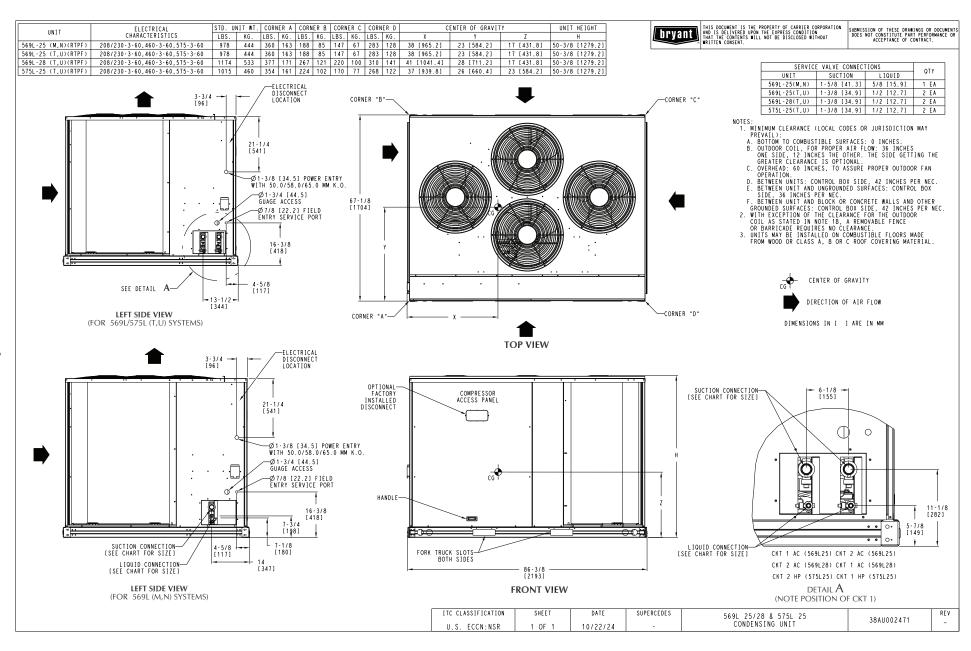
569L*25(M,N) / 569L*25-28(T,U) Base Unit Dimensions
